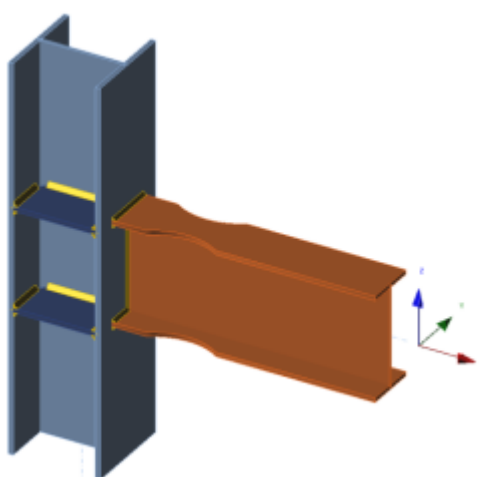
Finite element Analysis Model of RBS Connection[2]
